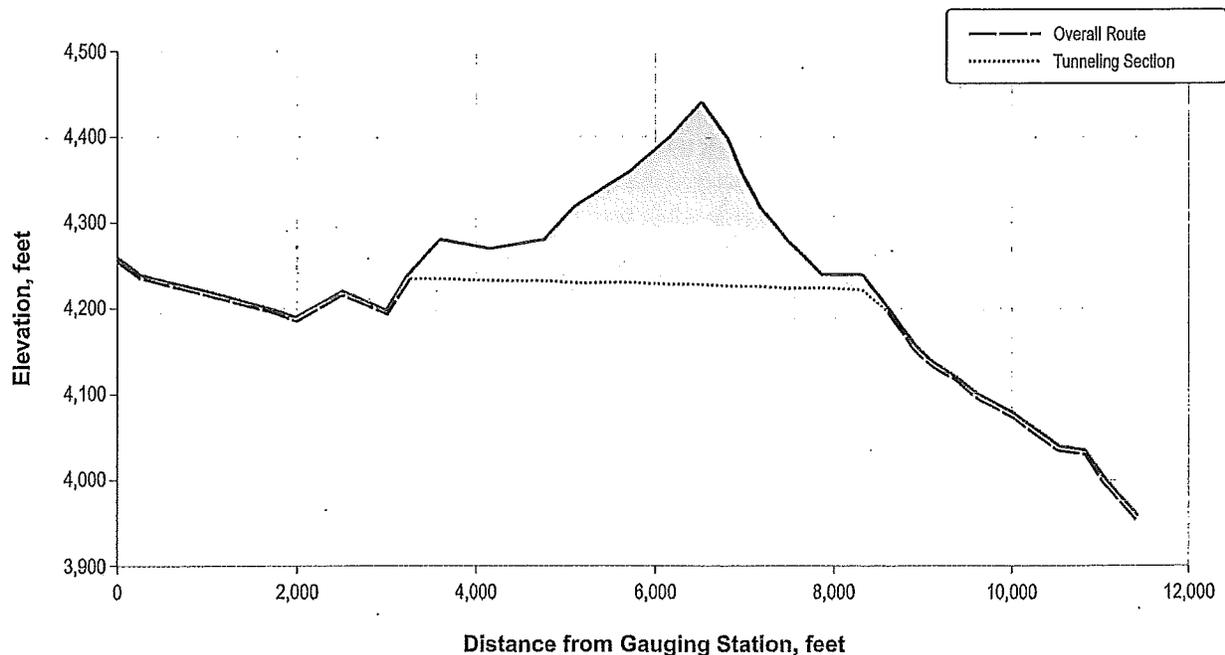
Profile of Alignment for Alternative Two—Tunneling
